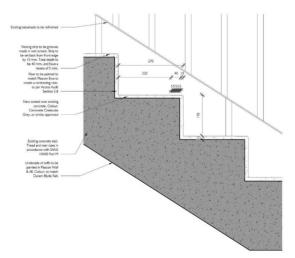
Detail of stair tread and nosing strip (by Author, not to scale)
